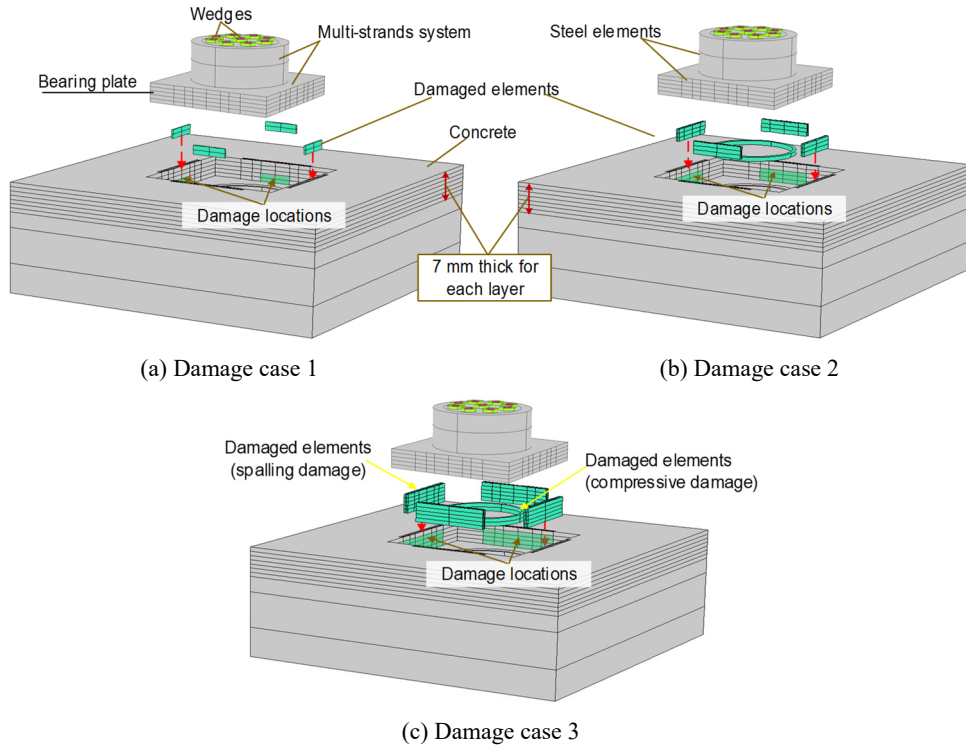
Locations and shapes of damaged elements in FE model of anchorage zone
